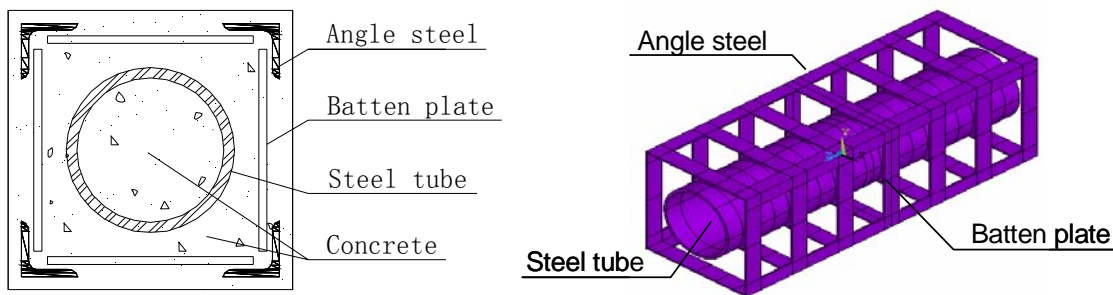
Common section forming of concrete-filled core steel tube with outer steel plank reinforced concrete column
